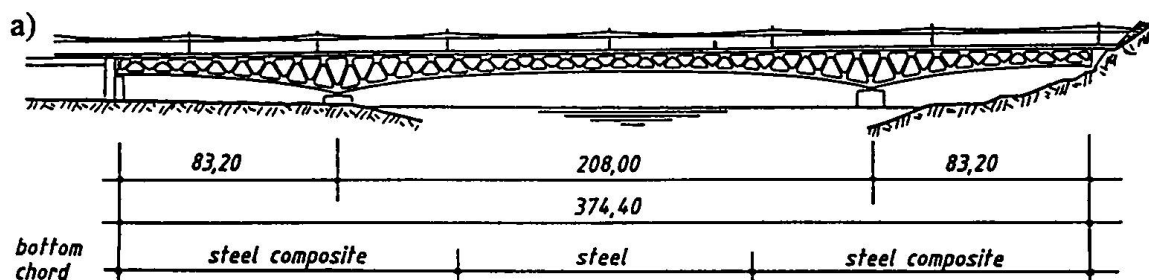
Railway Bridge across Main River at Nantenbach, Germany: a) Layout
